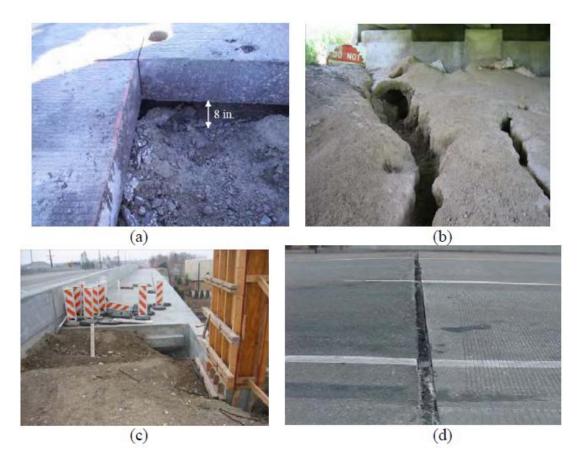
(a) Observed Void under the Approach Slab, (b) Soil Erosion of Granular Backfill, (c) Non-compacted Granular Backfill Behind the Bridge Abutment from Poor Construction Practice, (d) Unsealed Expansion Joint (White et al., 2005)
